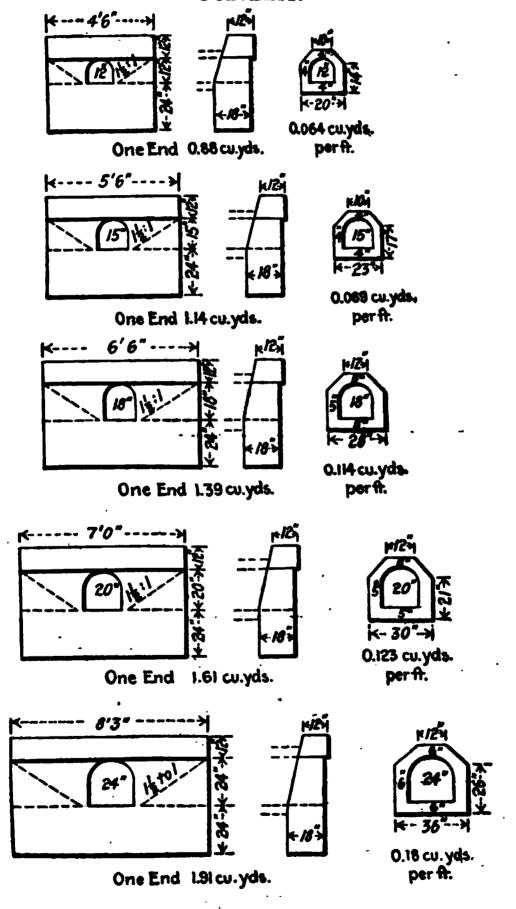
MASSACHUSETTS STANDARD FOR CONCRETE ARCH CULVERTS.
